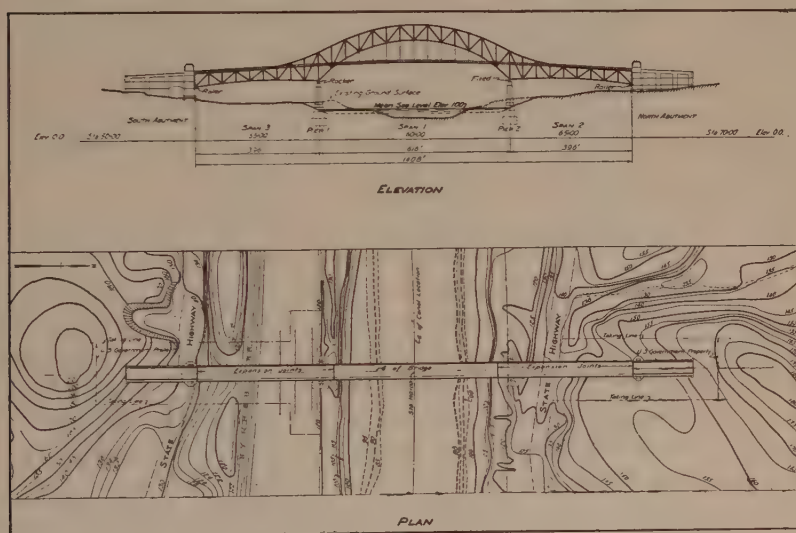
PLAN AND ELEVATION OF HIGHWAY BRIDGE AT BOURNE
